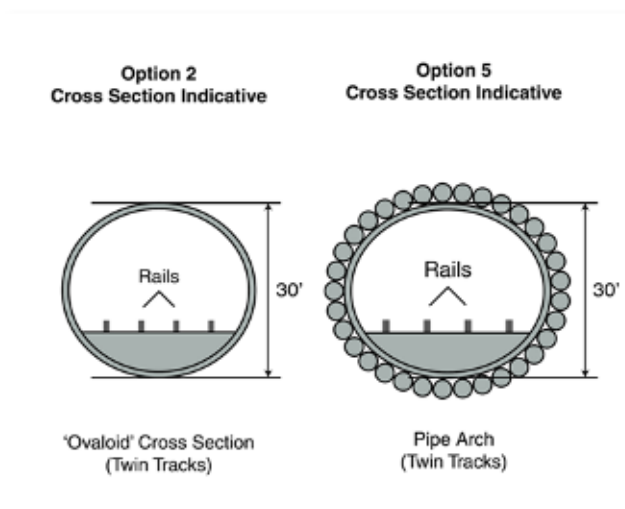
Single (Larger) Tunnel (Cross Section View)
